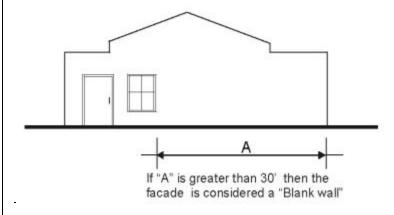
(D): Example of a blank wall that must be modified or otherwise altered under the provisions of this subsection.
